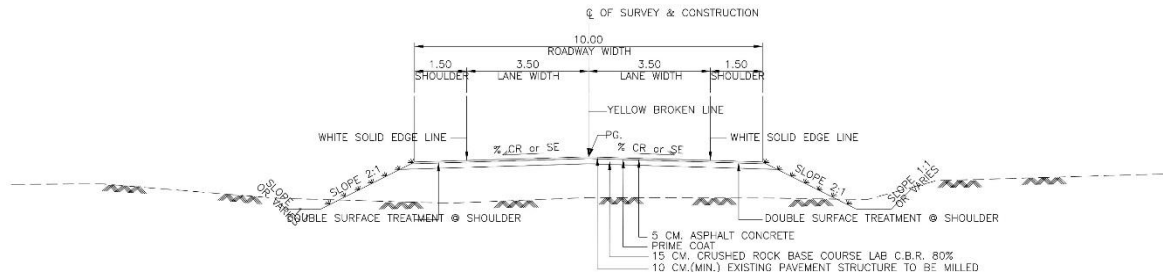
Alt.3 Asphalt Concrete: Carriageway and Cape Seal/DBST: Shoulder
